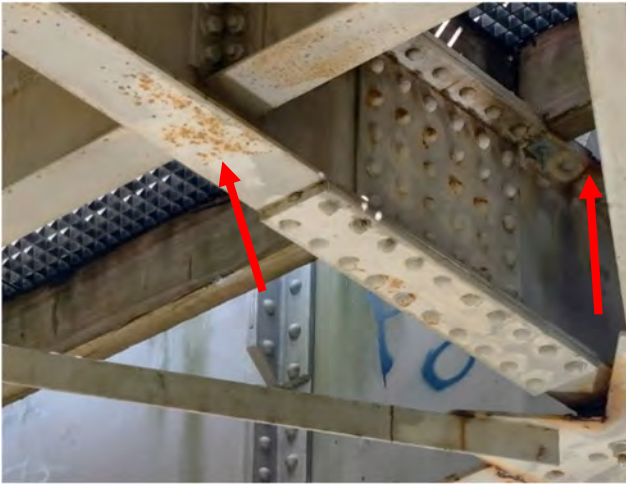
Span 6 cross girders surface corrosion and more significant corrosion
